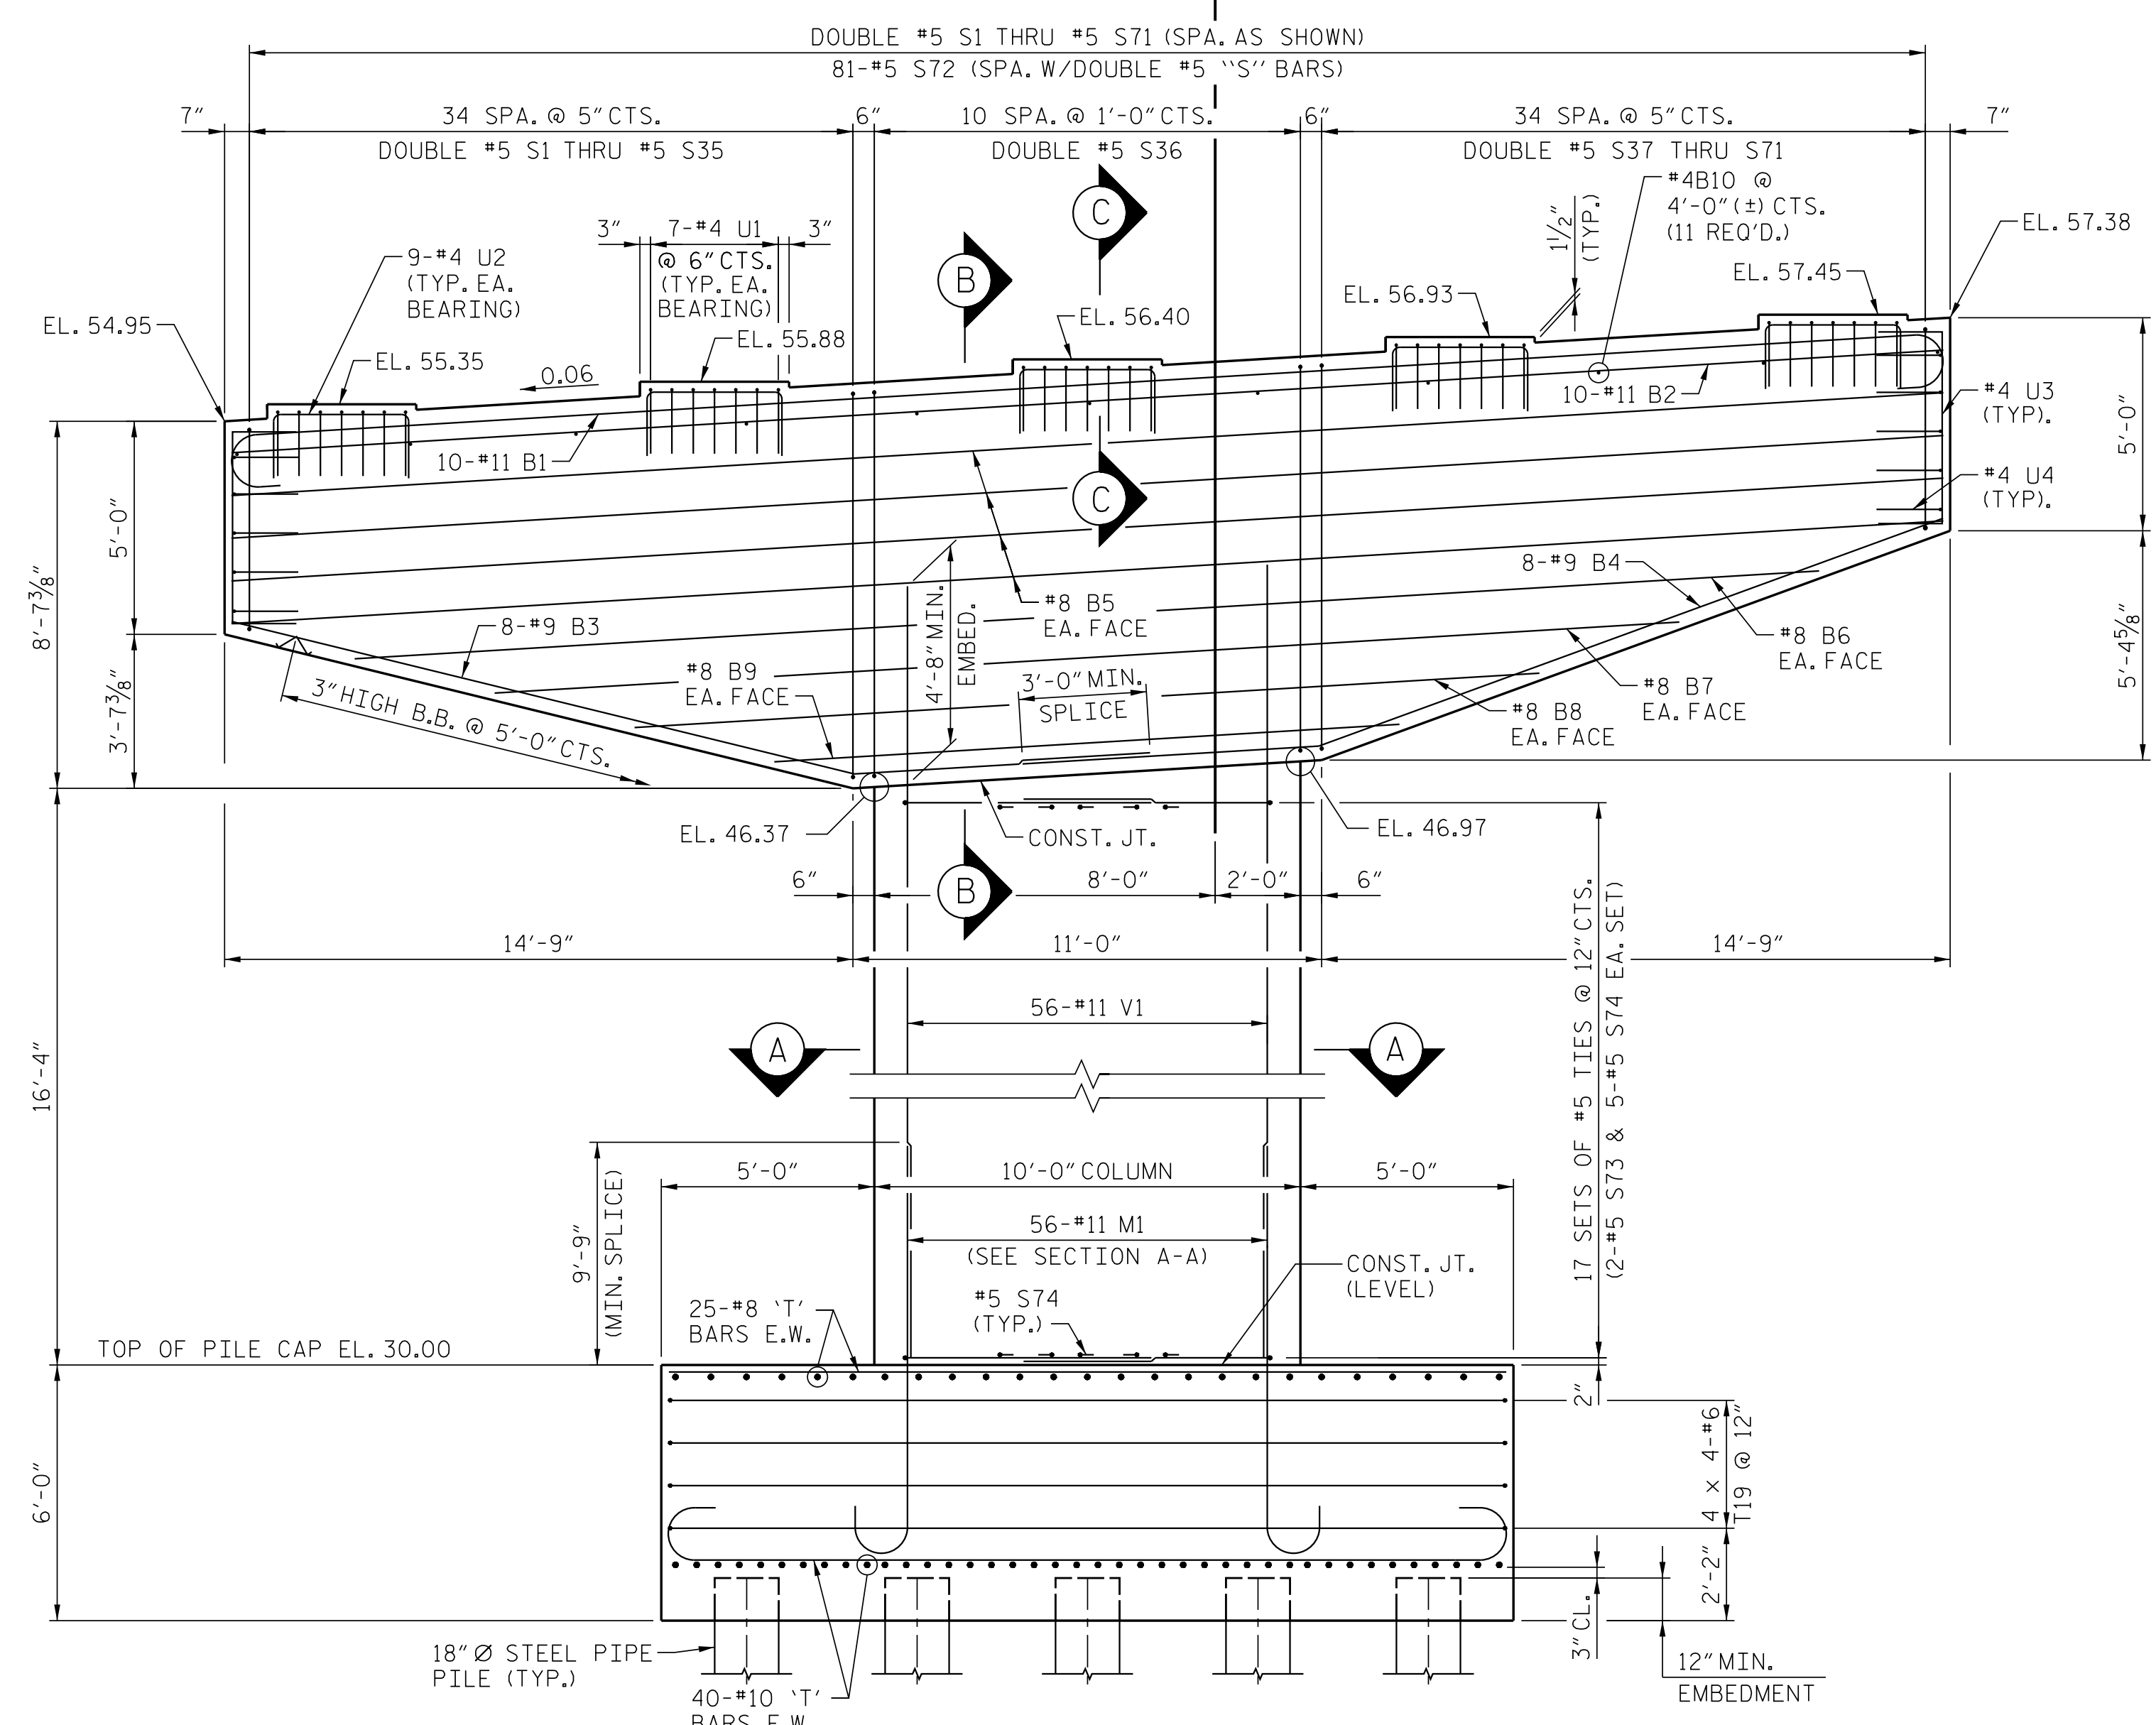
DETAILED DRAWINGS FOR FALSEWORK AND FORMS FOR THIS HAMMERHEAD BENT CAP SHALL BE SUBMITTED, SEE SHEET SN.
